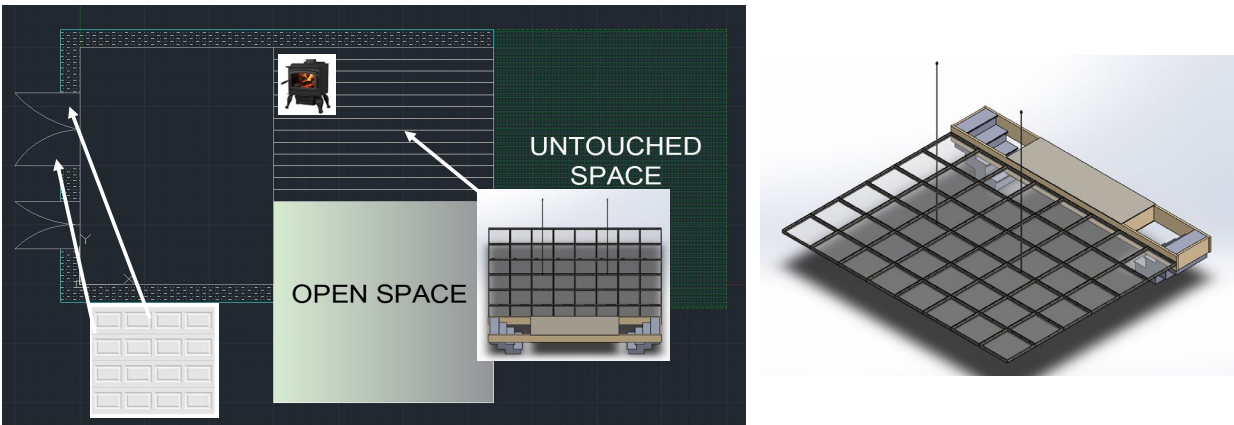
Harmony Barn Spring 2022 design concept floor plan (left) and custom glass ceiling (right)
